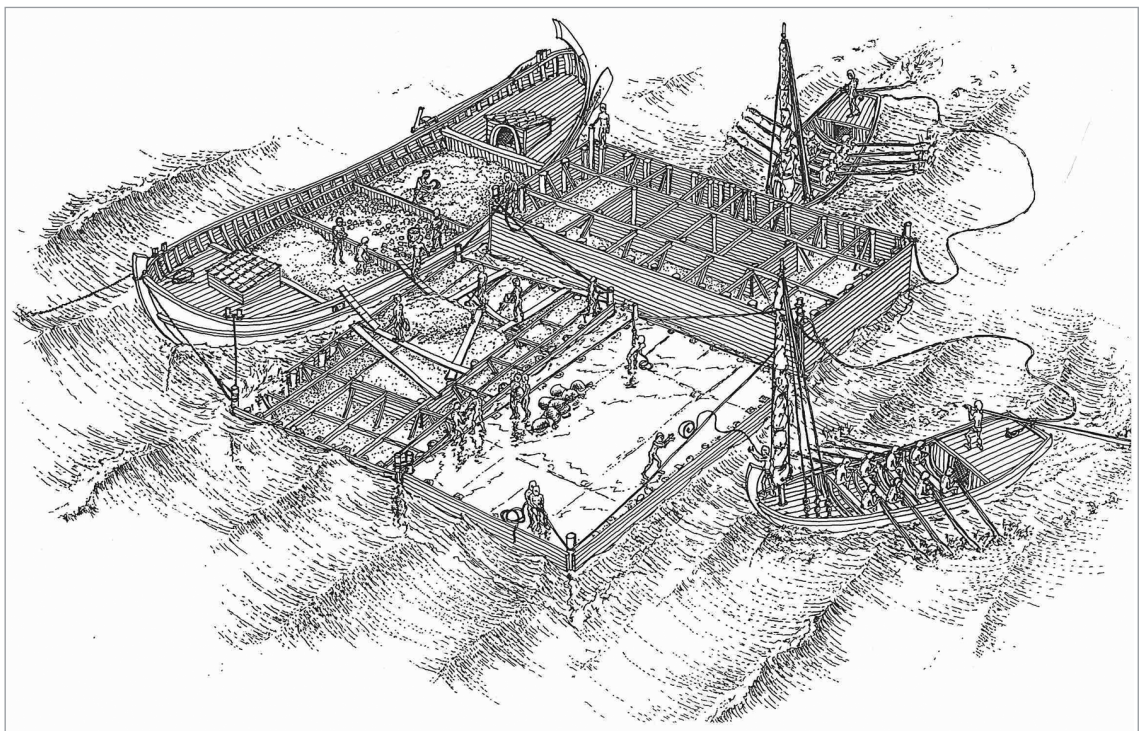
Reconstruction sketch of caissons being filled with concrete and sunk.
